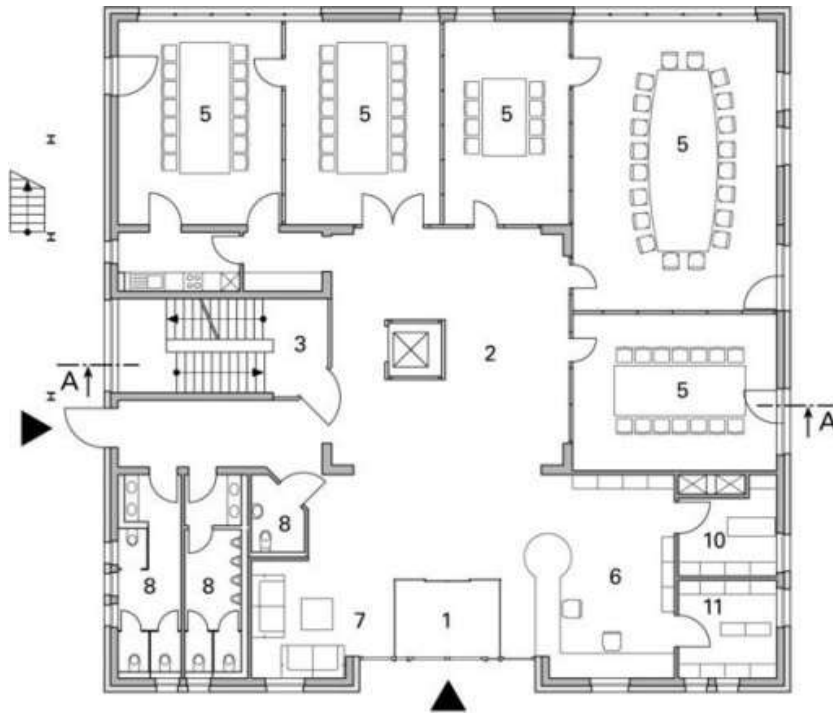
Bionorica Headquarter - Ground plan of first floor (bba, 2008)
